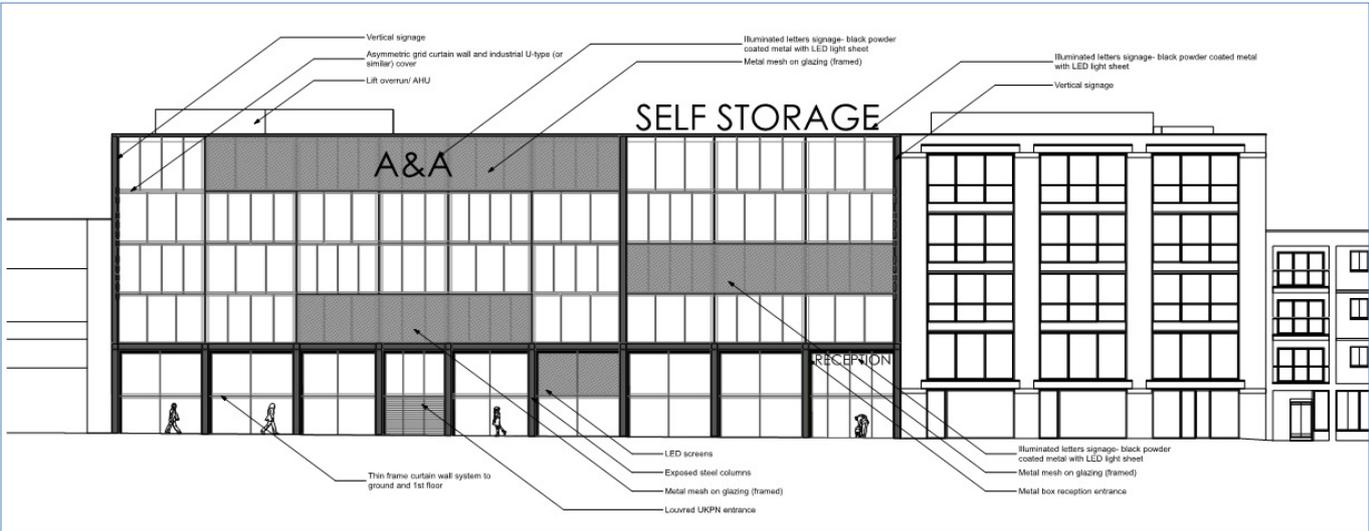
Proposed Brewery Road elevation (front) of withdrawn application.
